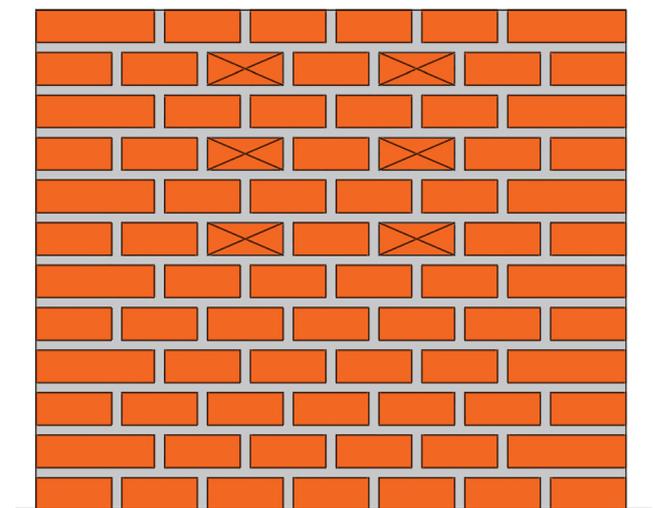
Illustration about the masonry wall elevation view (voids are marked with X)
